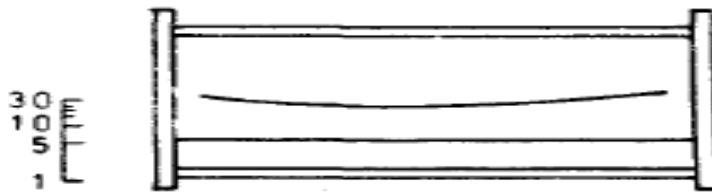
SIDE GLAZING IN A MULTI-STOREY BUILDING (GLASS AREA 74 PERCENT OF FLOOR AREA)
